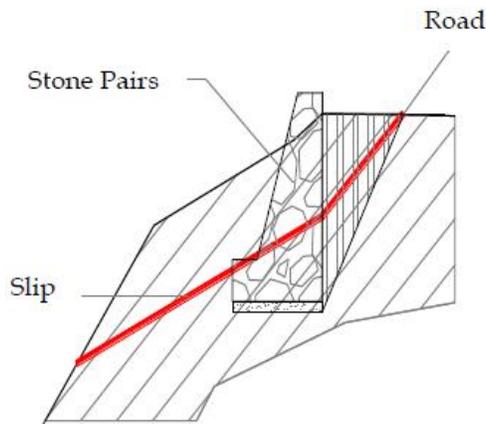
Reconstruction of retaining wall for handling Nagrak road avalanche
